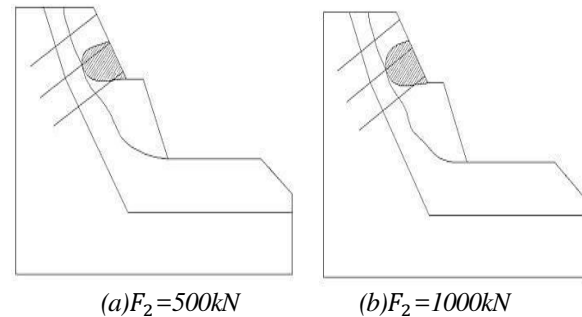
The overlap of cable frame precompression zone of third slope and secondary slope
